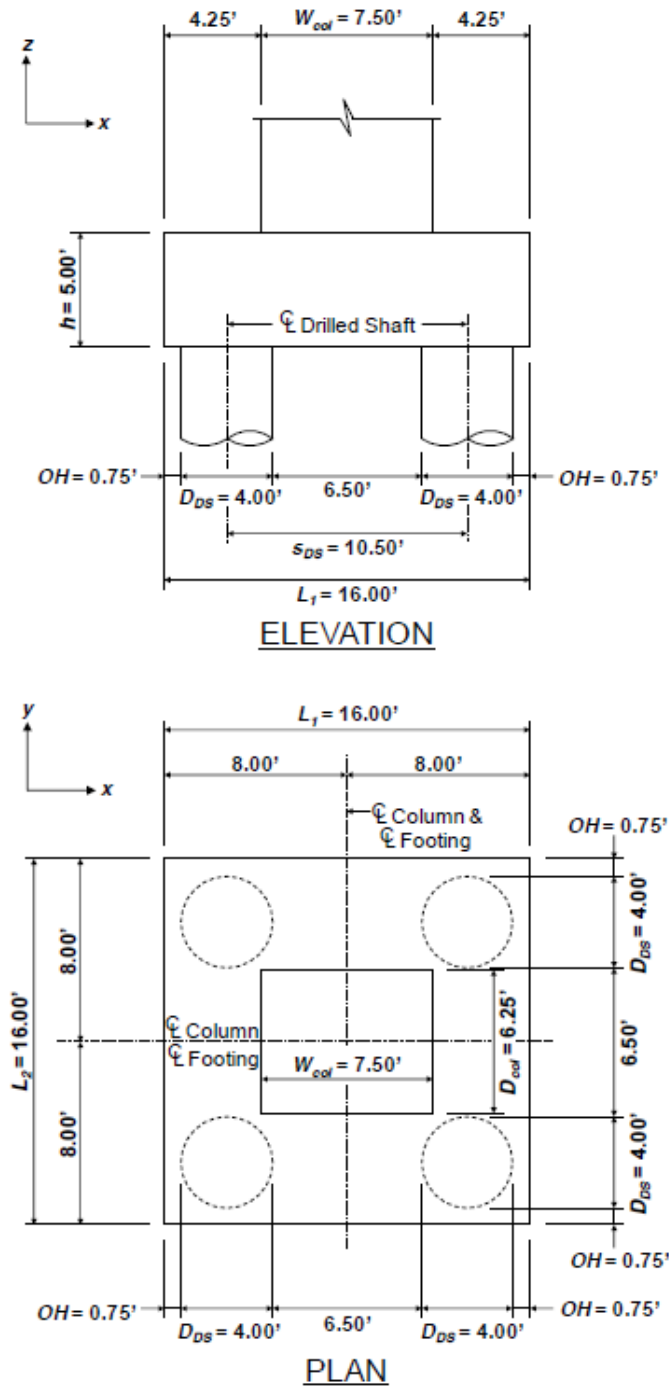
Geometry of the drilled shaft footing for the design example (Williams et al., 2012)
